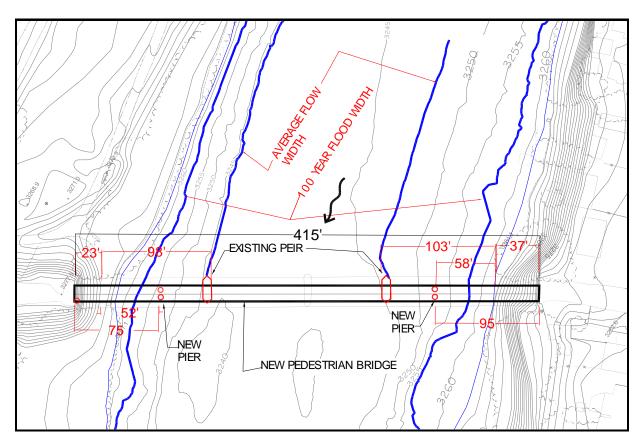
Plan View of New Pedestrian Bridge showing distance of new and existing piers from embankments
